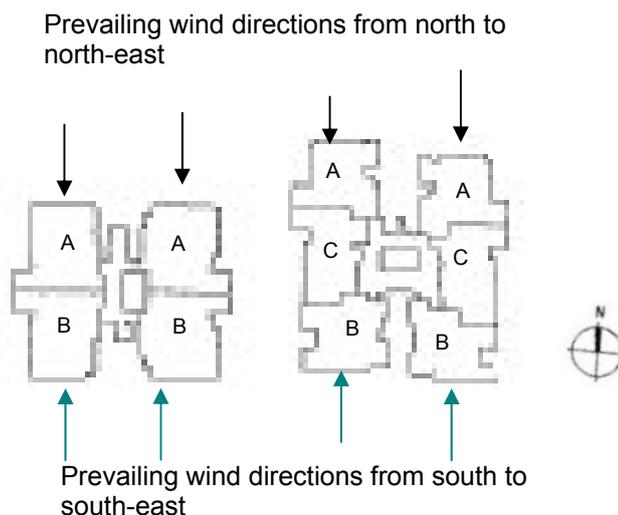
Building layout showing all dwelling unit Type A and B with window openings facing either the north or south direction. The dwelling unit Type C has no window openings in the north and south directions. In this instance, no unit can be considered meeting the requirement 1-2(a) Option 2(i)
